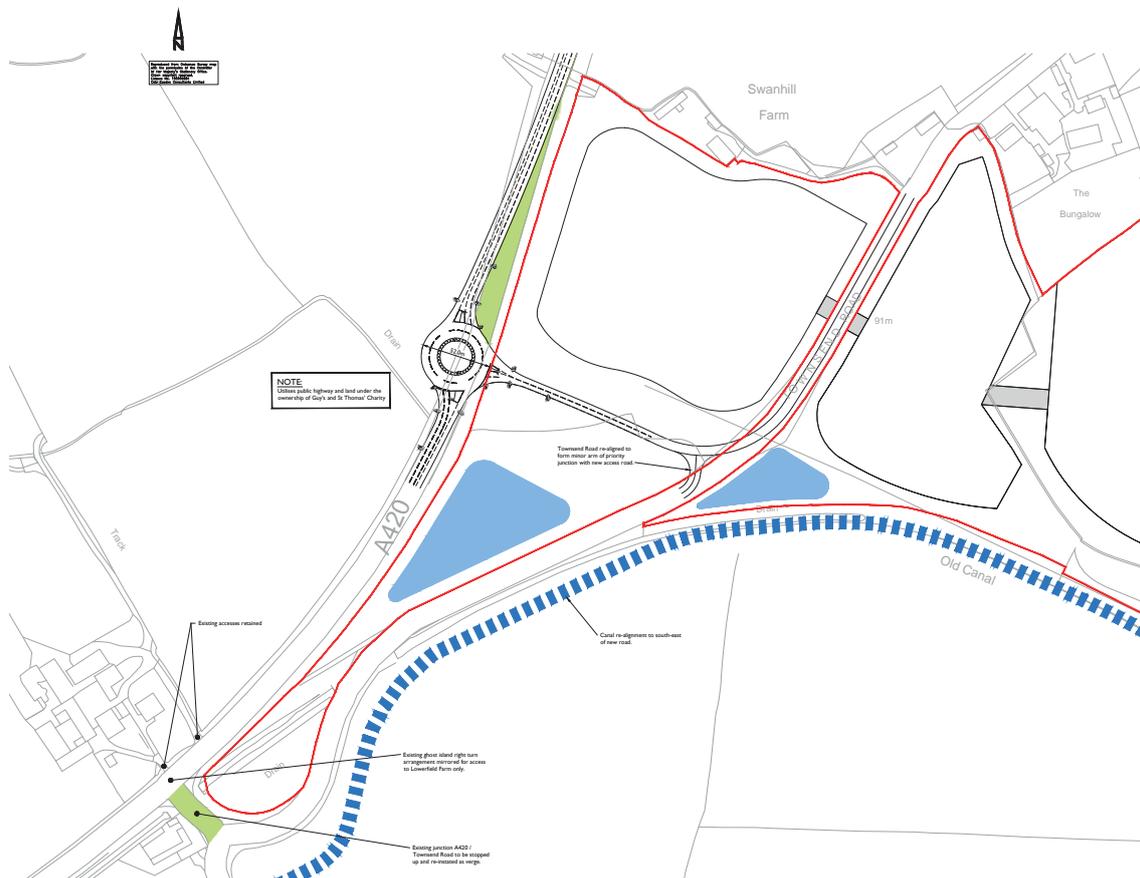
NEW ACCESS ARRANGEMENT OFF A420 - OPTION 2
